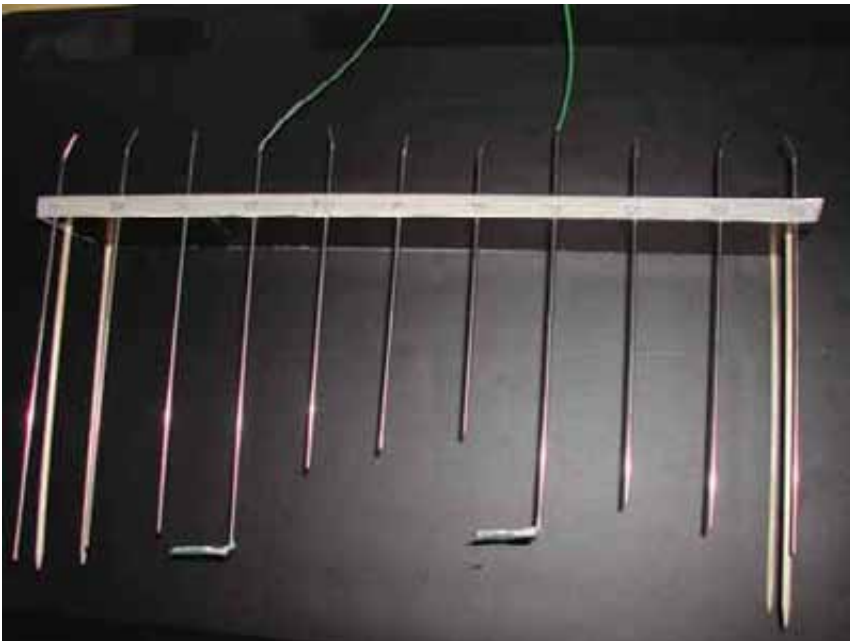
Placement of thermocouples in the large slab specimens.
